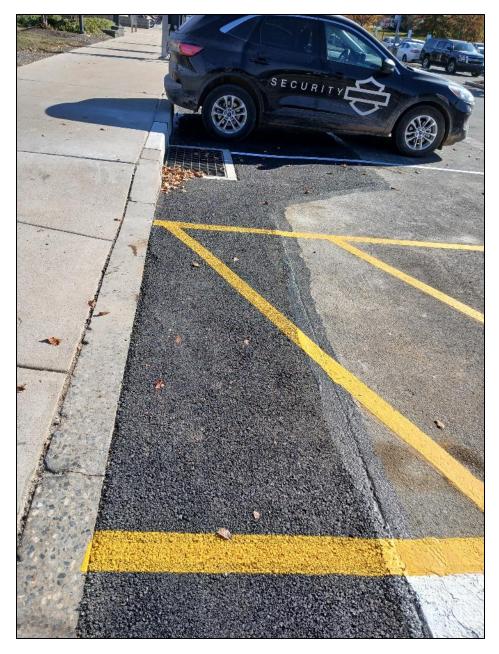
Photo looking east at asphalt installed around new stormwater inlet. Seam between new and old asphalt was sealed.
